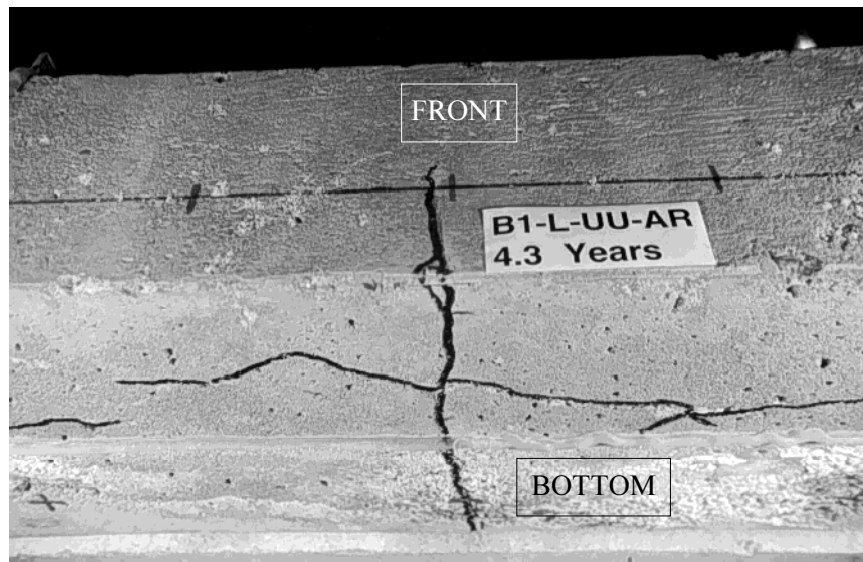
Cracking on initially uncracked, unloaded beam B1 (front and bottom surfaces as in exposure).
